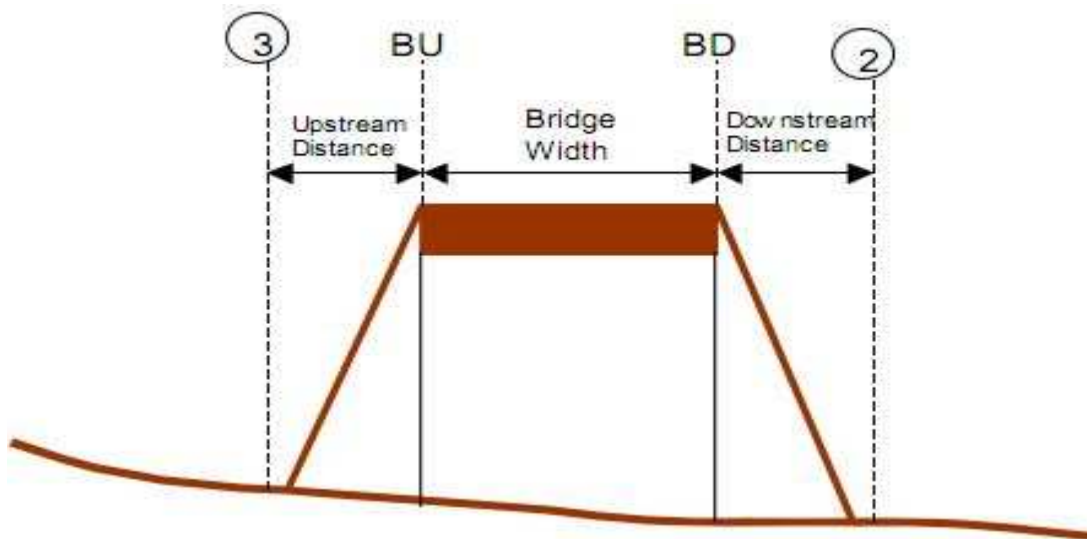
Bridge bounding cross sections (after USACE 2006)
